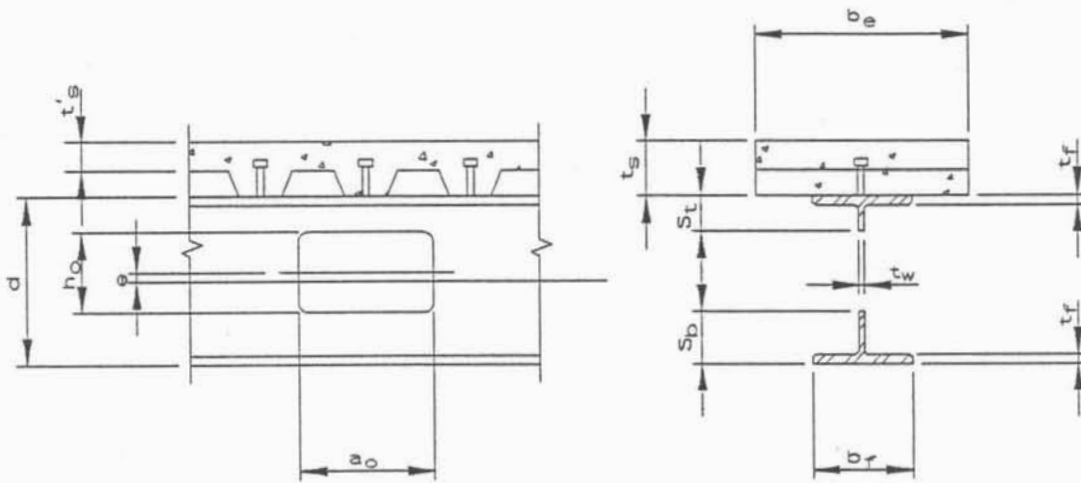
(b) Opening Configuration for an Unreinforced Composite Beam with Transverse Ribs
